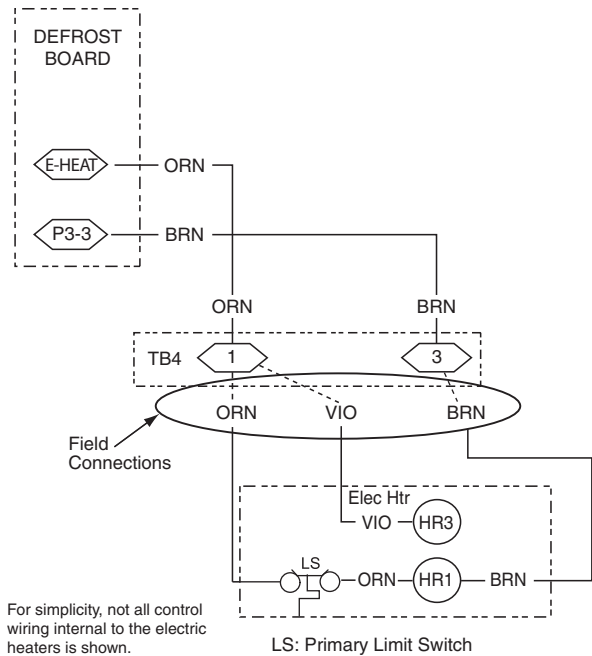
Accessory Electric Heater Control Connections (HP-2, Size 06, 575V Only)
